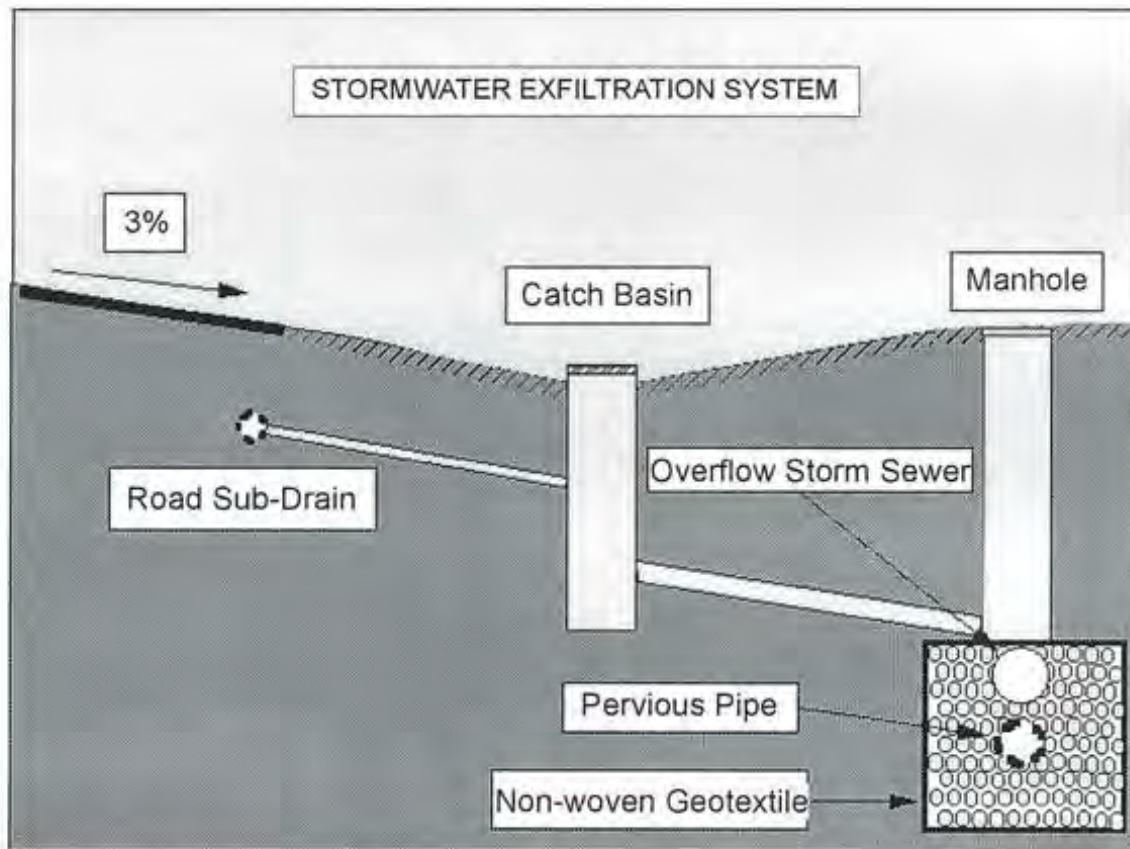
Stormwater Exfiltration System and Pervious Pipe Detail (MOEE, 1994a)
